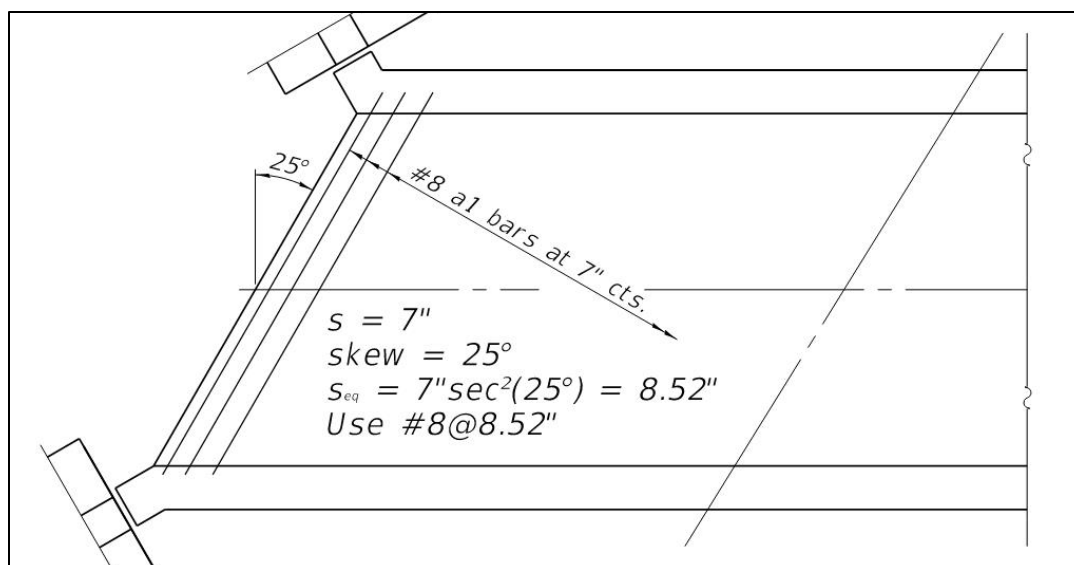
Spacing detailed perpendicular to bars
